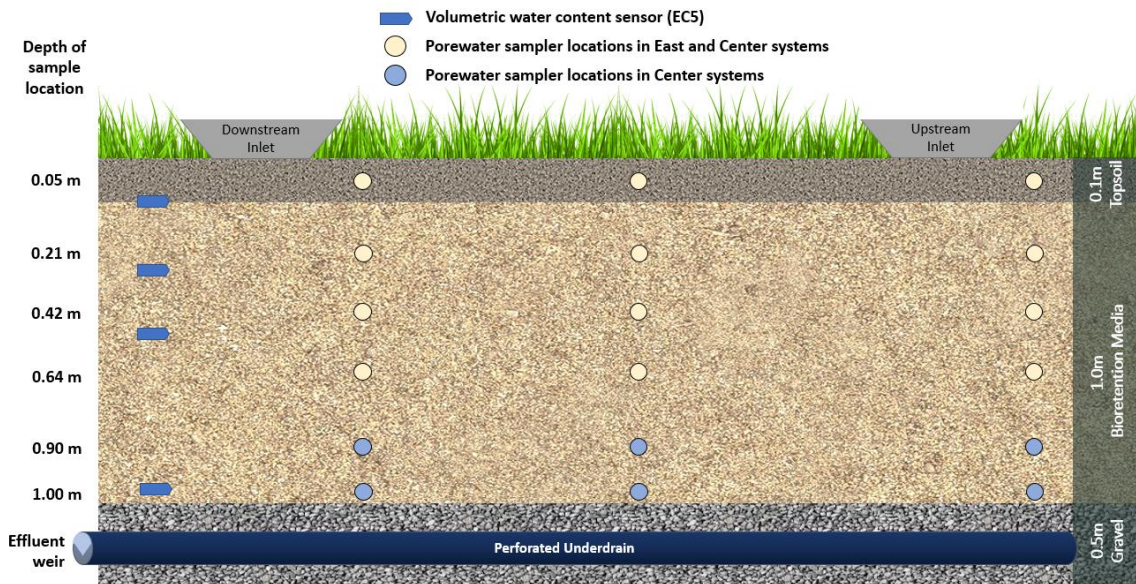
Cross-section of bioretention system showing the layout of porewater samplers and volumetric water content sensors installed in the East and Center bioretention systems.
